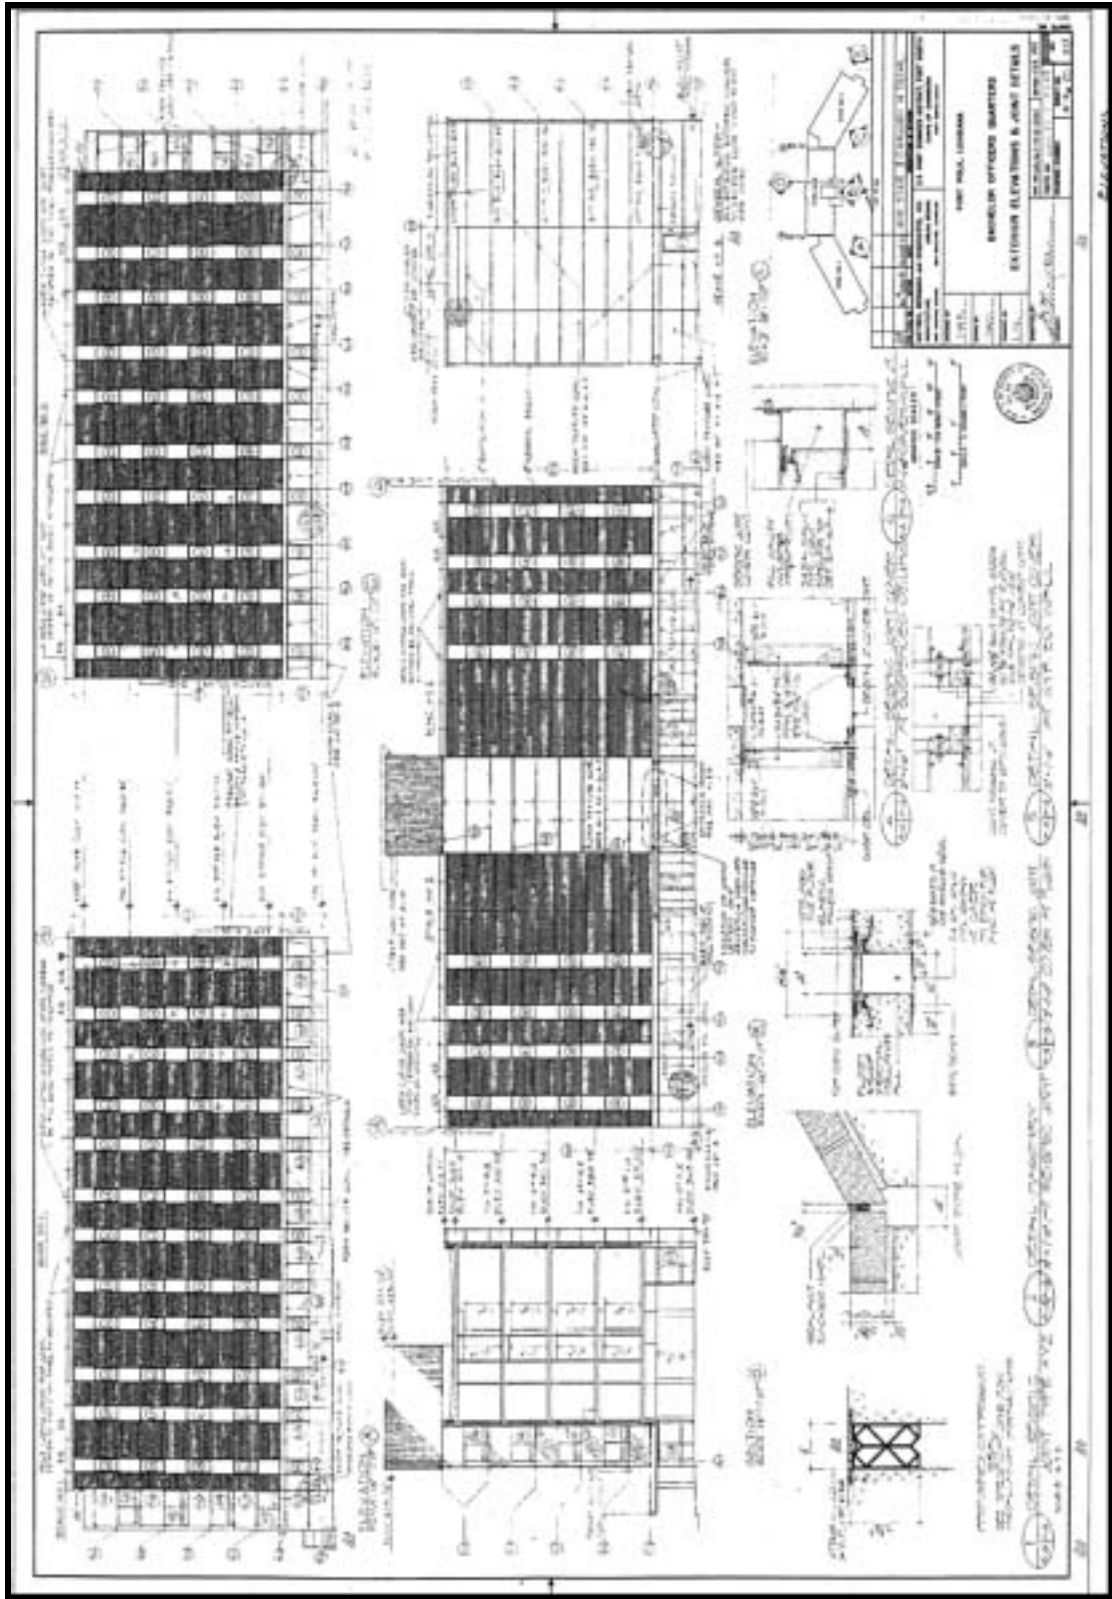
High Rise BOQ, Woodfill Hall, elevations, Ft. Polk (1977, revised 1977) (Engineering, Ft. Polk).
